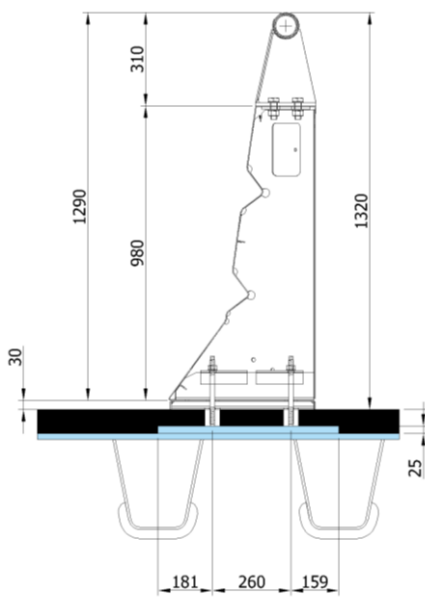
Sergard MDS H2 barrier section and anchorage detail
